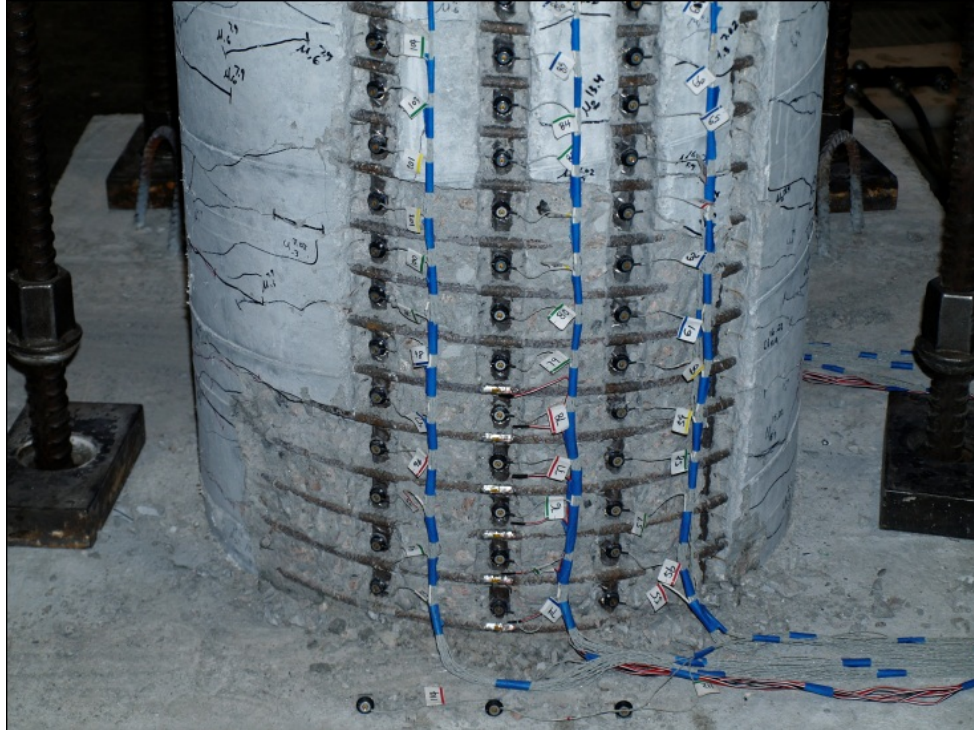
Test 10b – North Side of the Column after the Test was concluded with Intact Reinforcement
